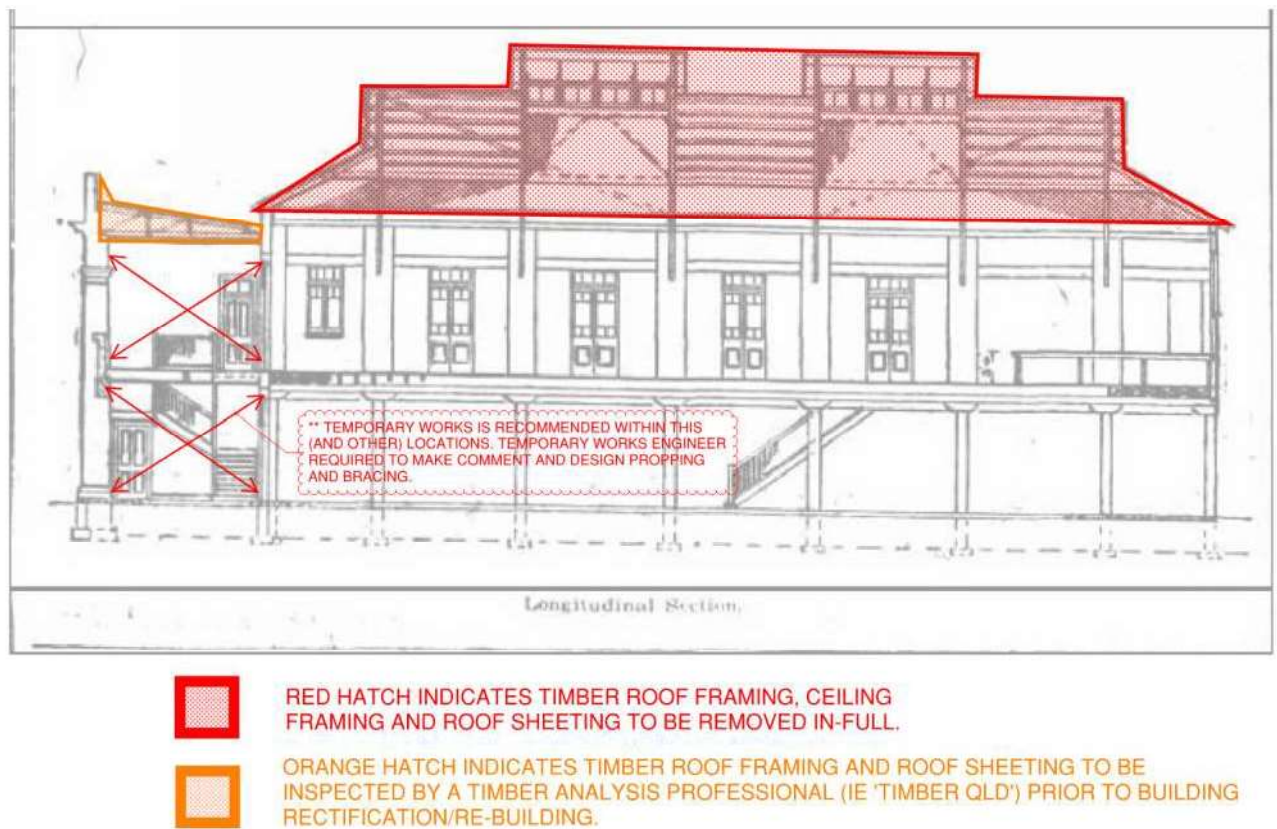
Extents of Roof Framing and Roof Sheetting to be Demolished and Removed Due to Excessing Damage.
